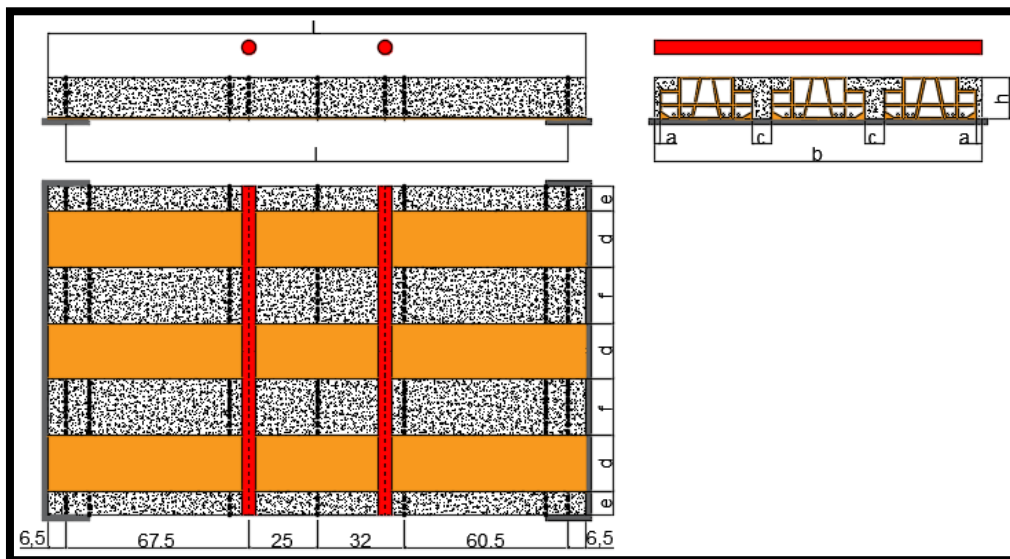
Design of the dimensions of the non - consolidated floor slab.
